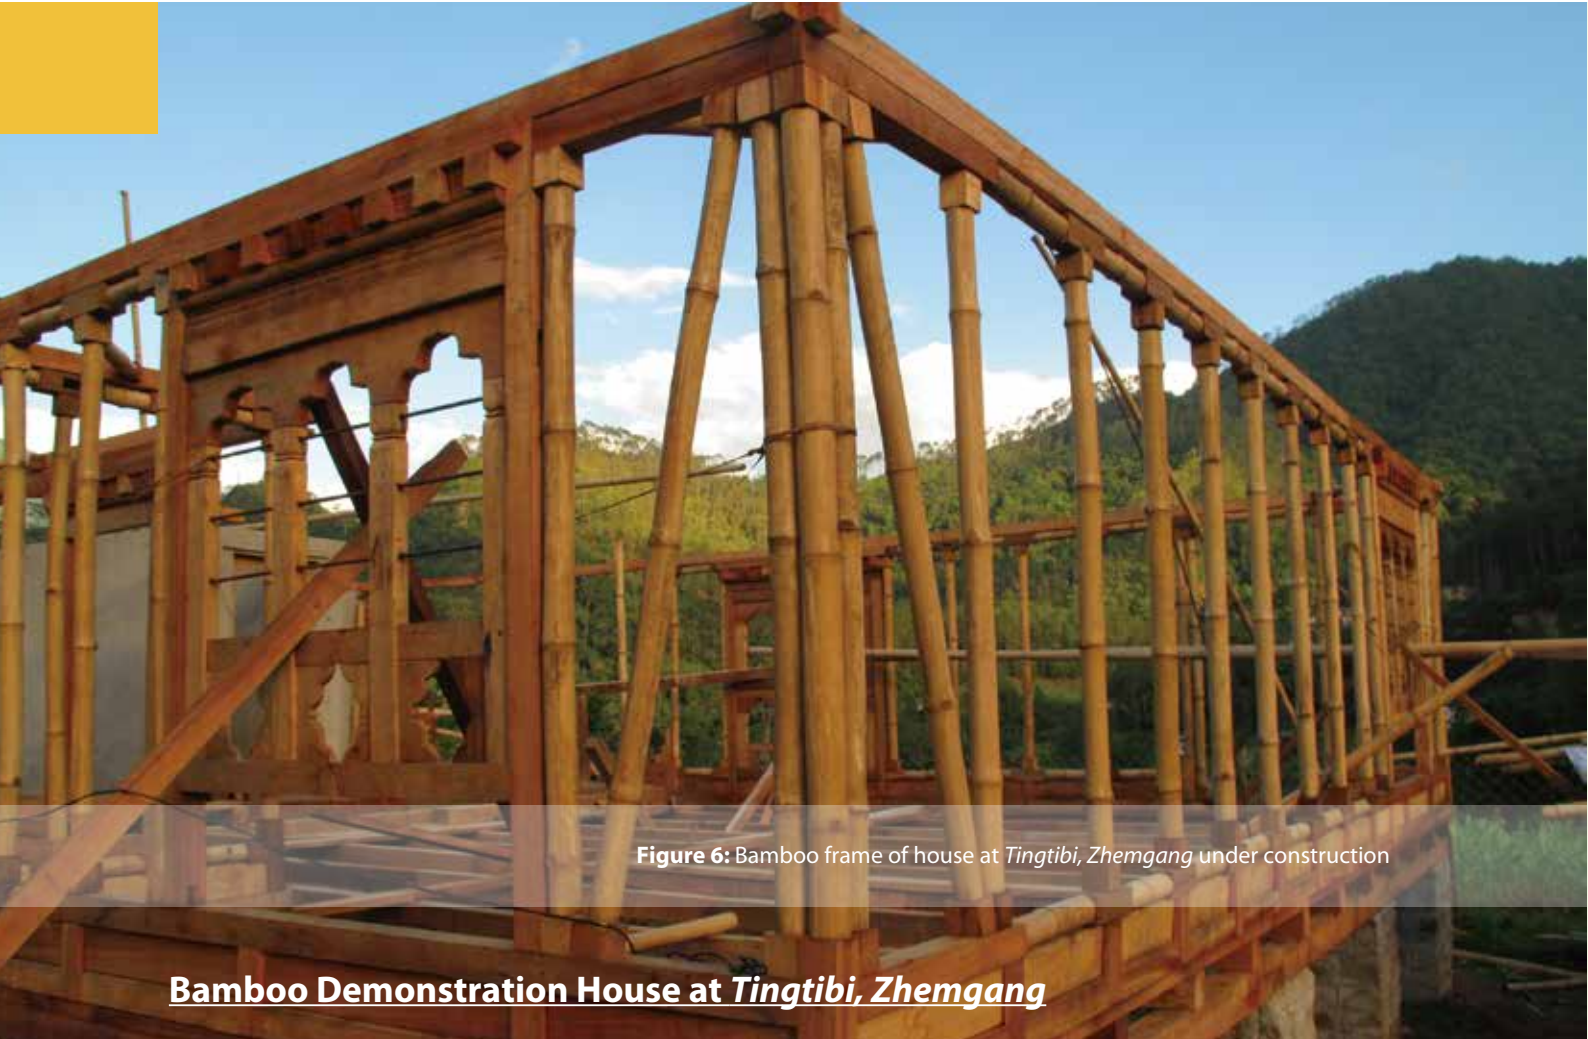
Bamboo frame of house at *Tingtibi, Zhemgang* under construction
